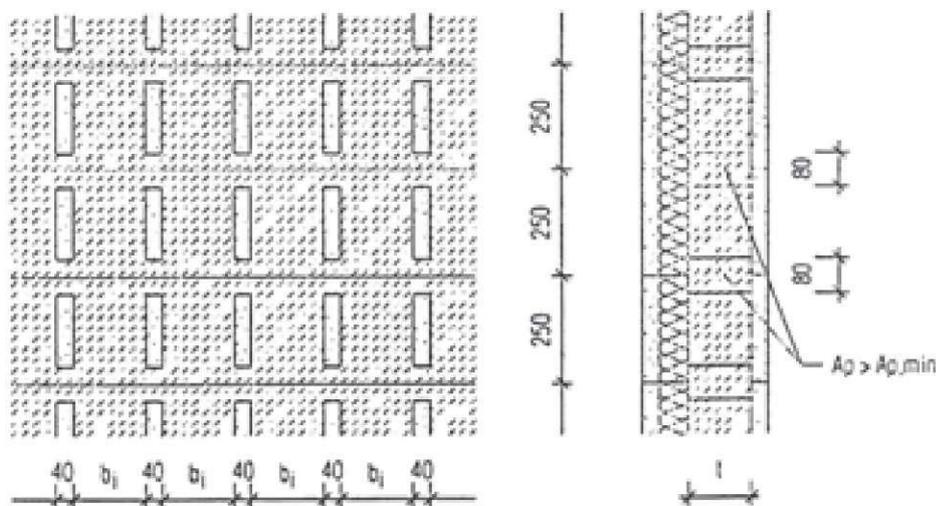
Width of the concrete bearing column b_i and crossbeam A_p
